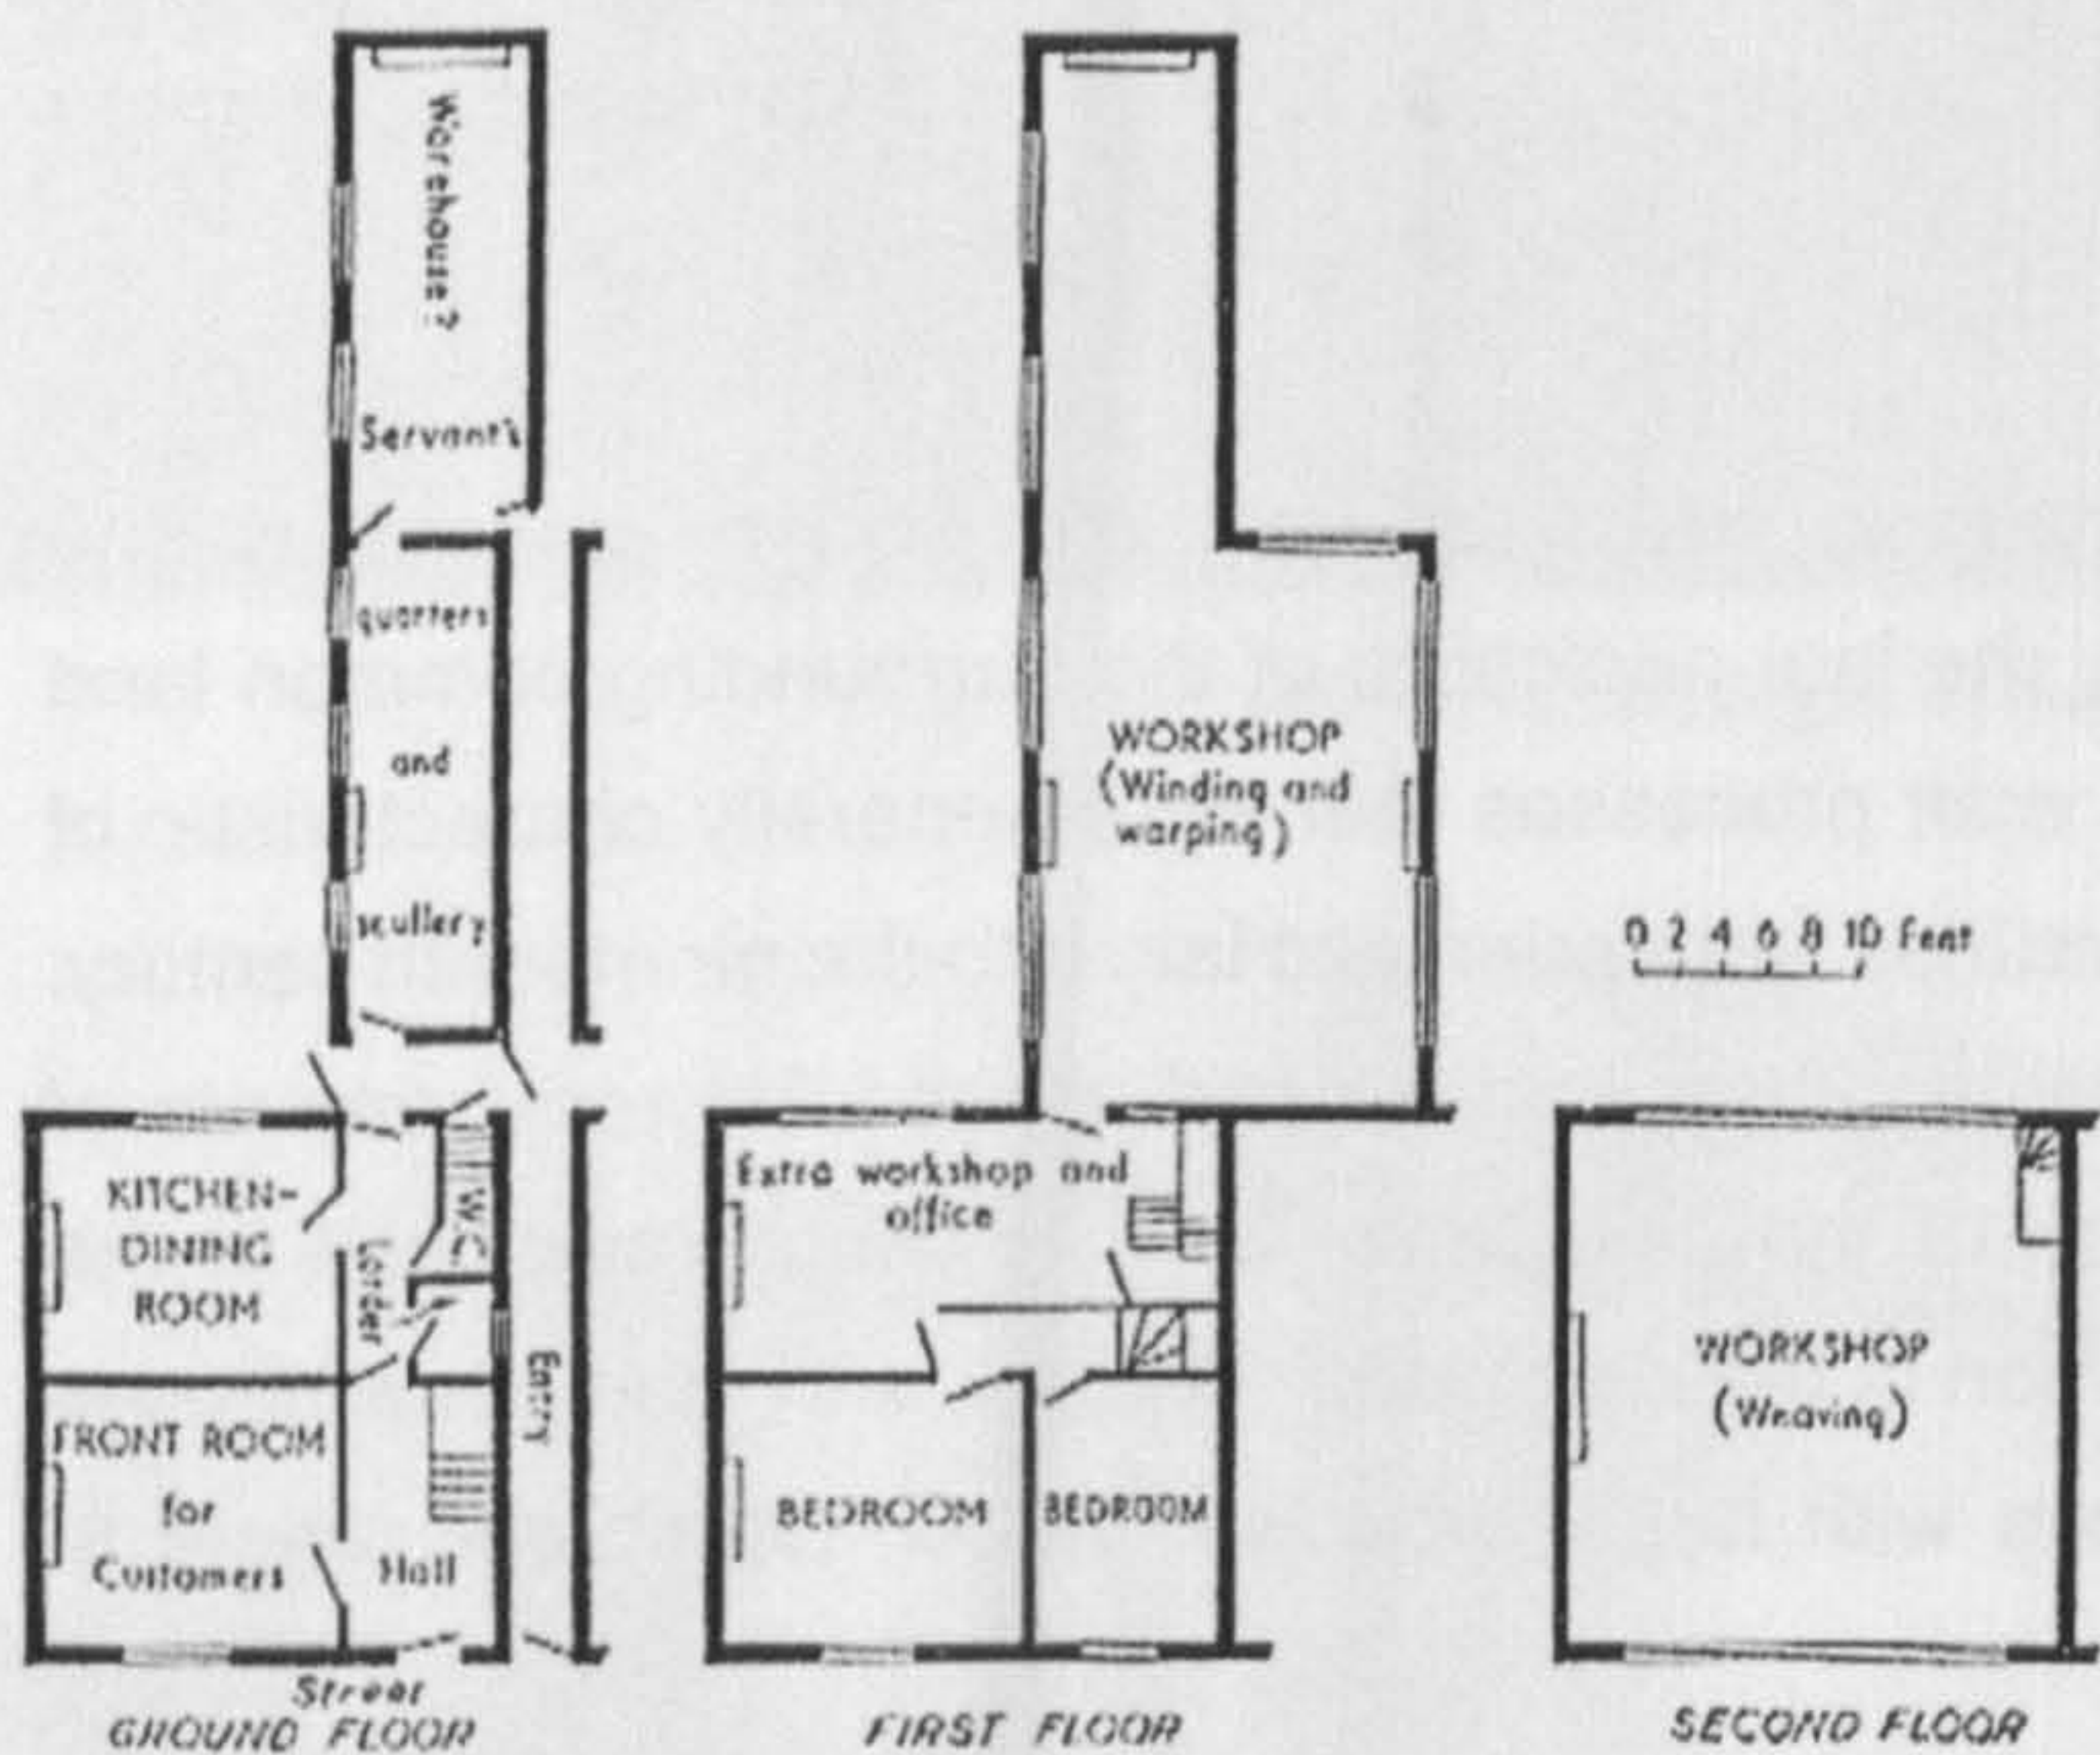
Plan, 32 Queen St Hillfields, Coventry, a prosperous ribbon manufacturer's house
